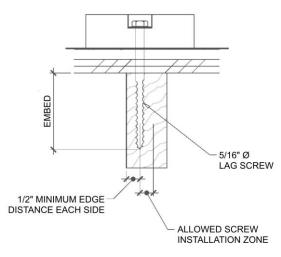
TYPICAL ANCHOR WITH LAG SCREW ATTACHMENT
